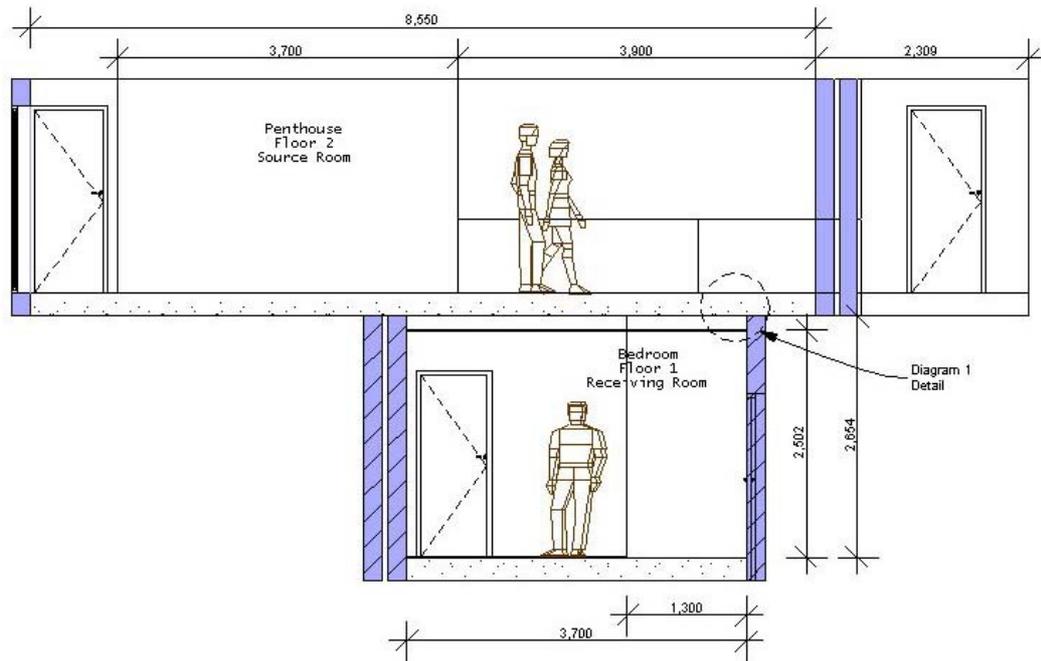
CROSS SECTION THROUGH FLOORS 1 & 2
